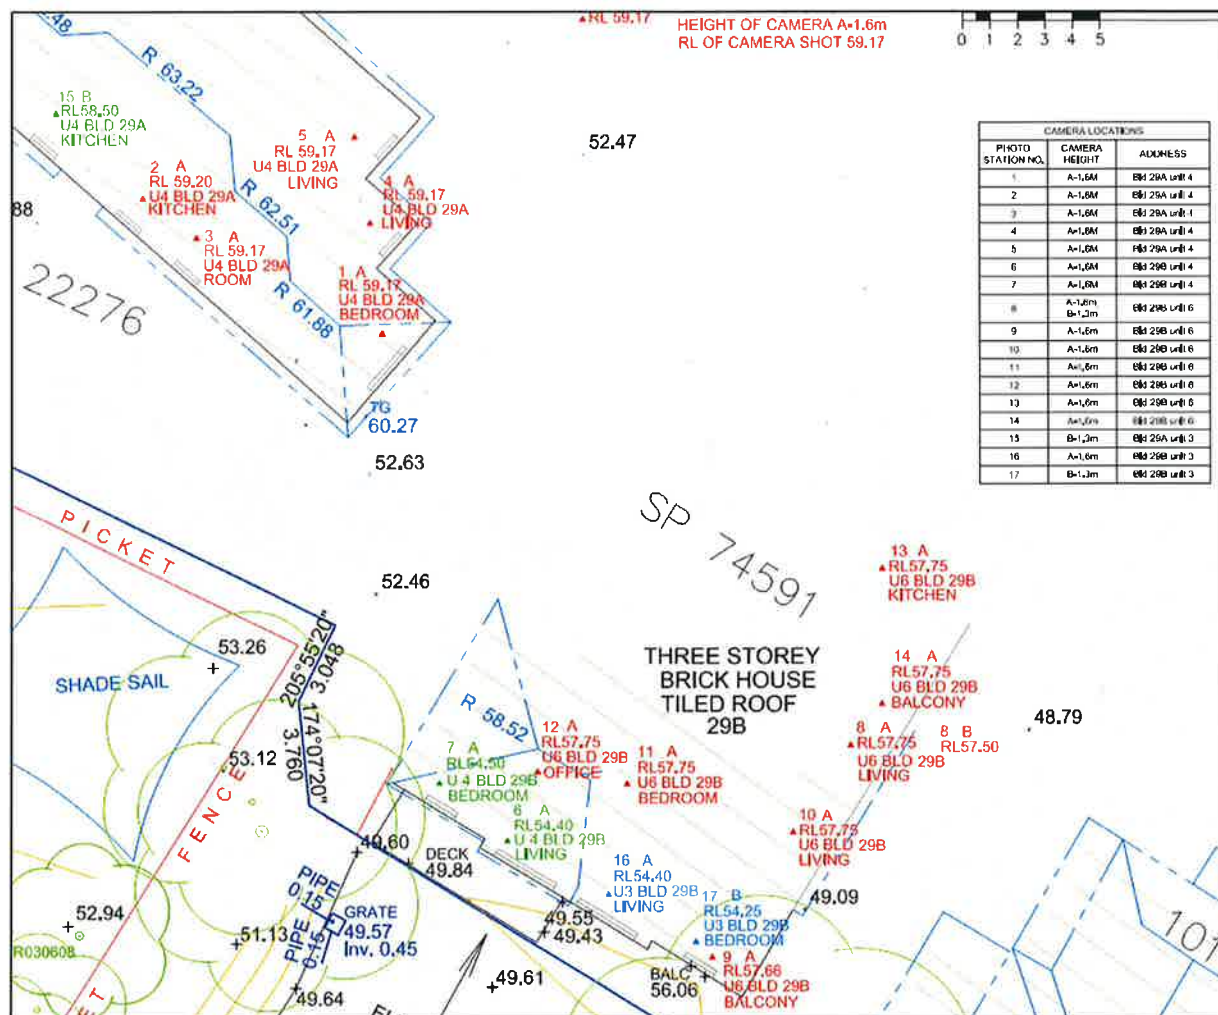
View Locations Plan, 29A and 29B Shirley Road
